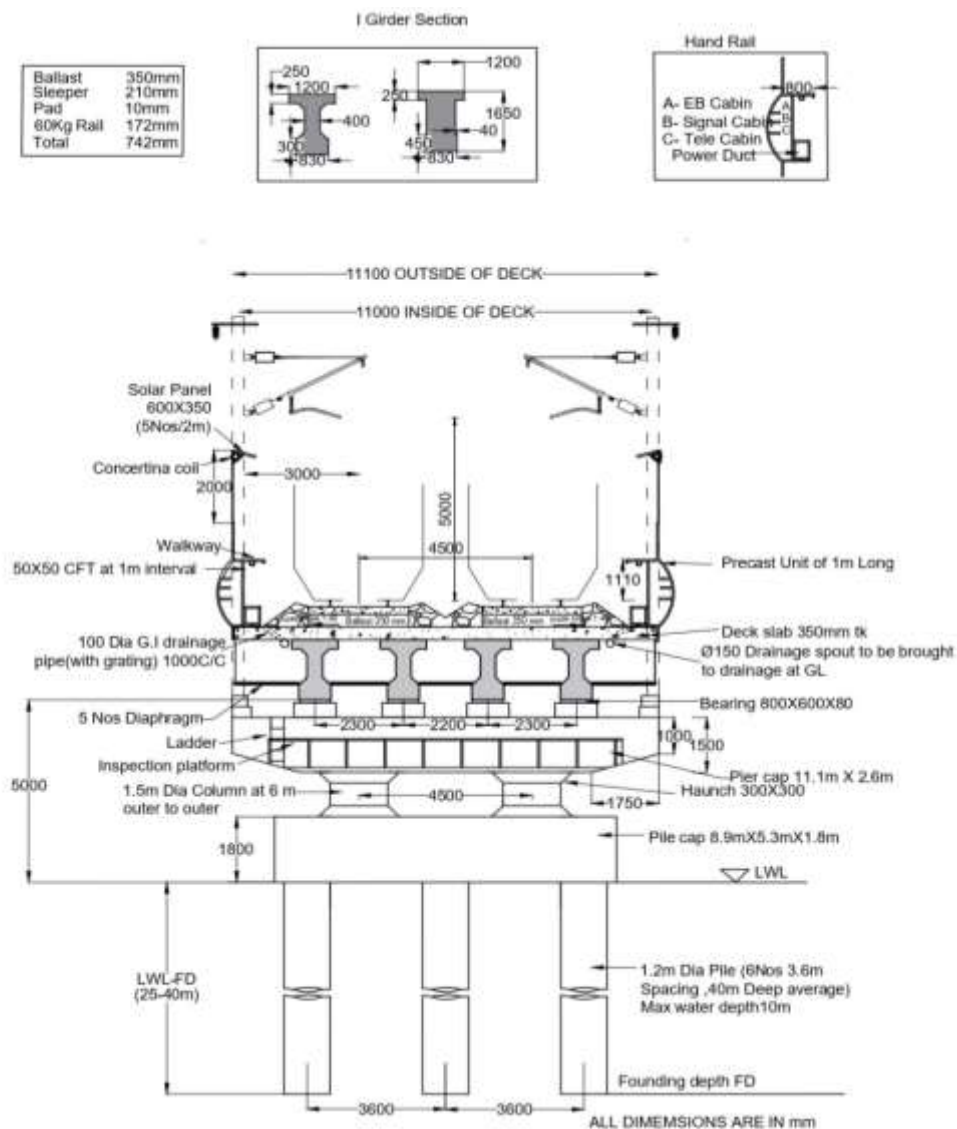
General Arrangement of River bridge with 4 - I girders, 2 – columns and 6 piles of 1.2m diameter
